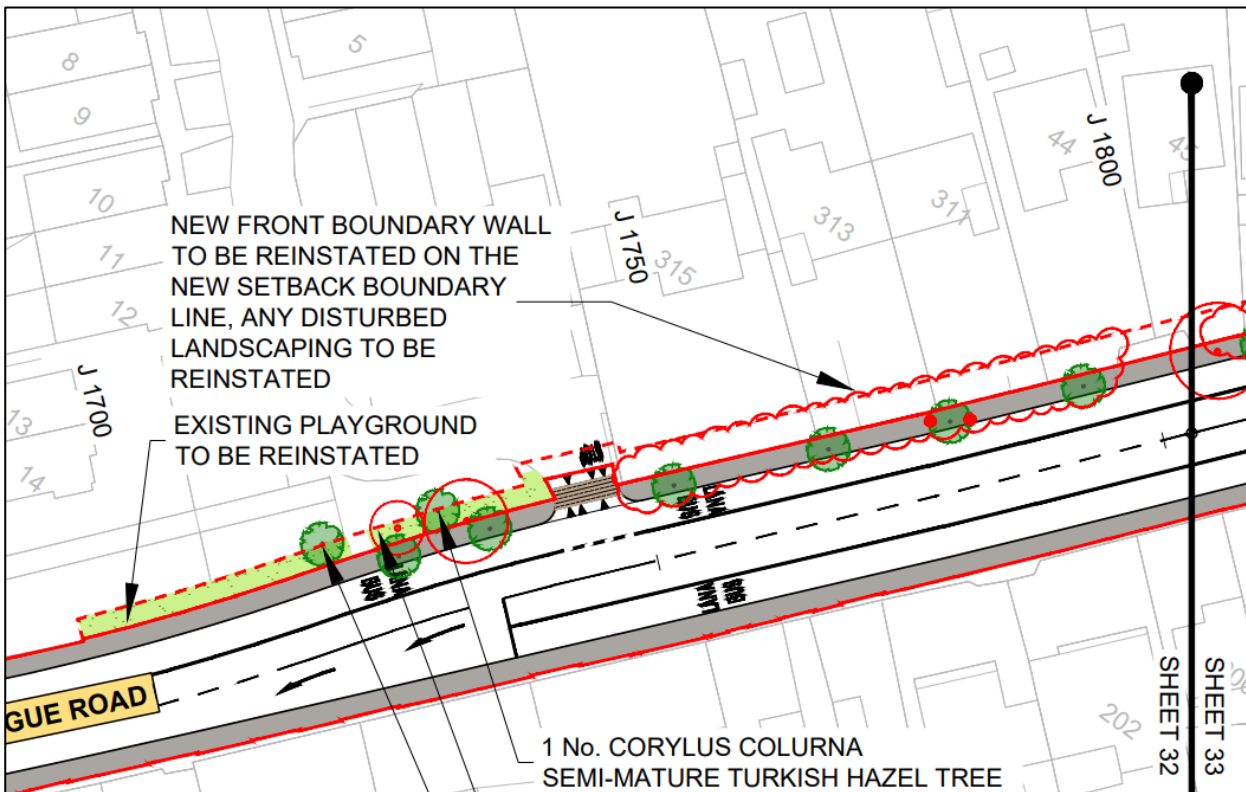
Landscape General Arrangement at Templeogue Road
